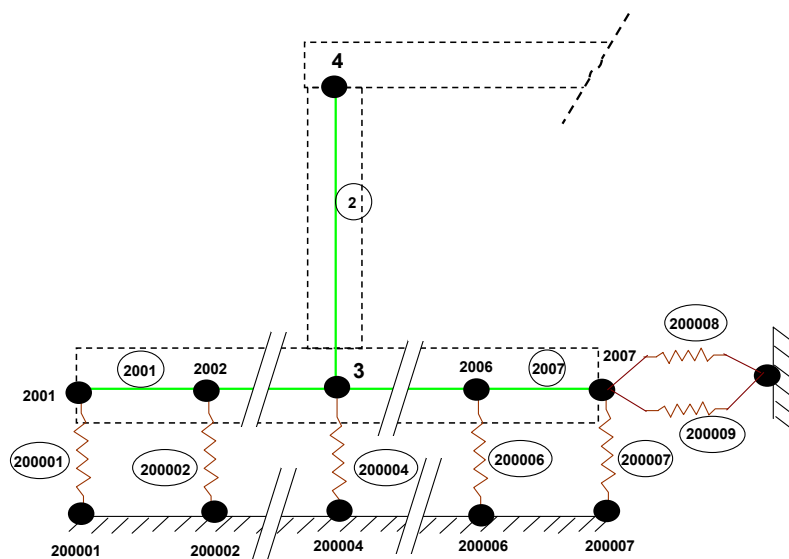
Example 2: Node and element configuration for foundation-2 and column-2
